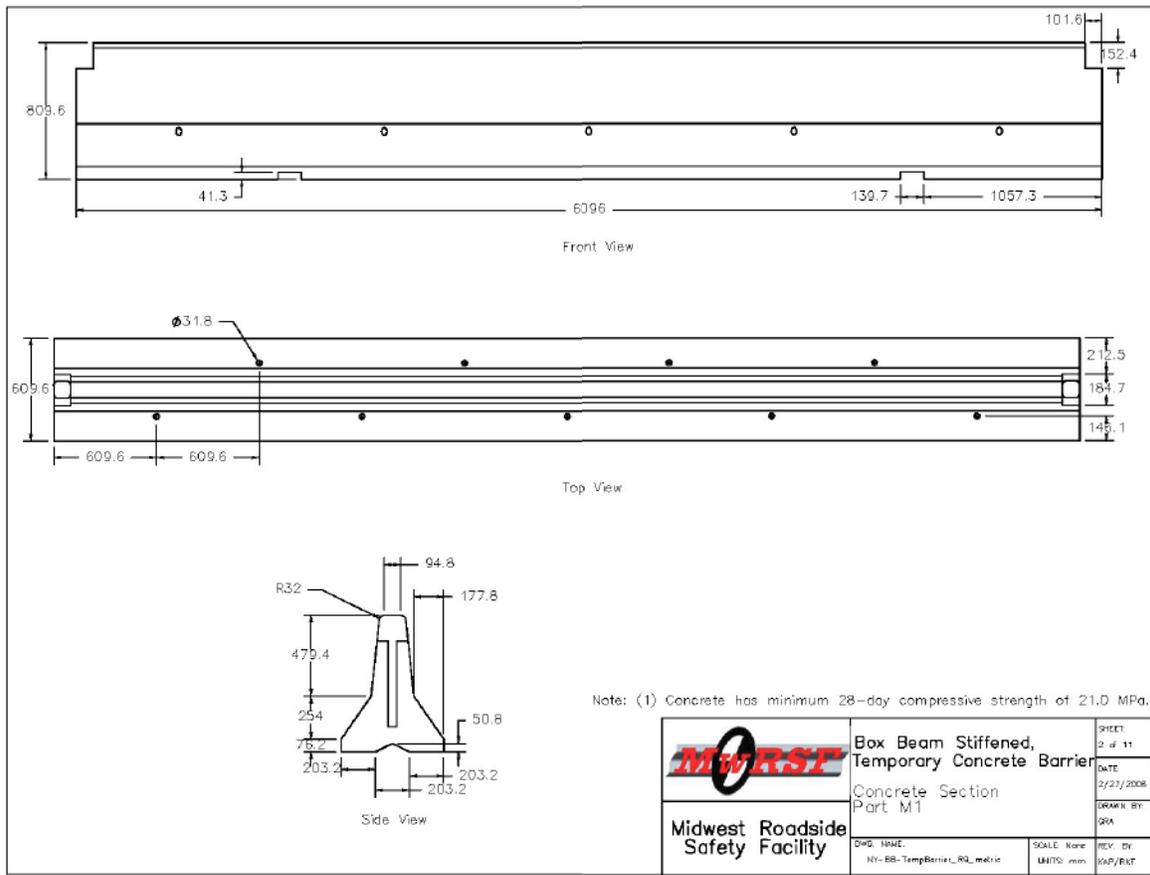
Temporary Concrete Barrier Details, Test NYTCB-1
